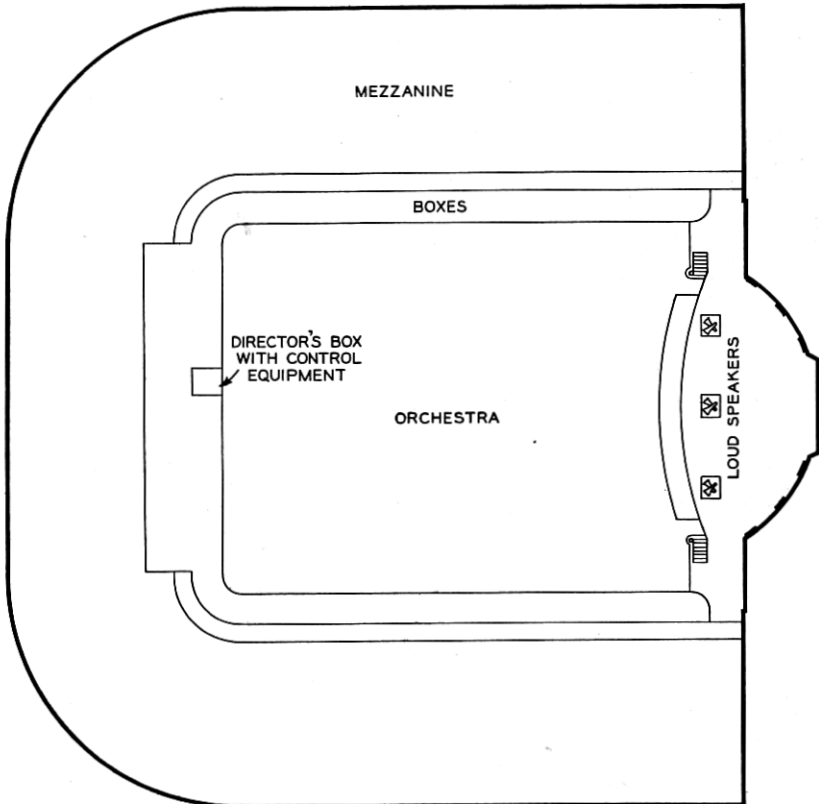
Floor plan of Constitution Hall, Washington, D. C., showing locations of loud speakers.
